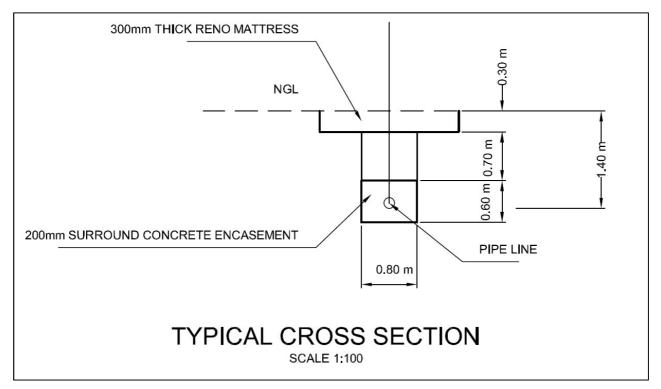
Typical cross section for watercourse crossing No. 6 (Drainage line: 29°03'34.09"S; 29°47'12.00"E)
